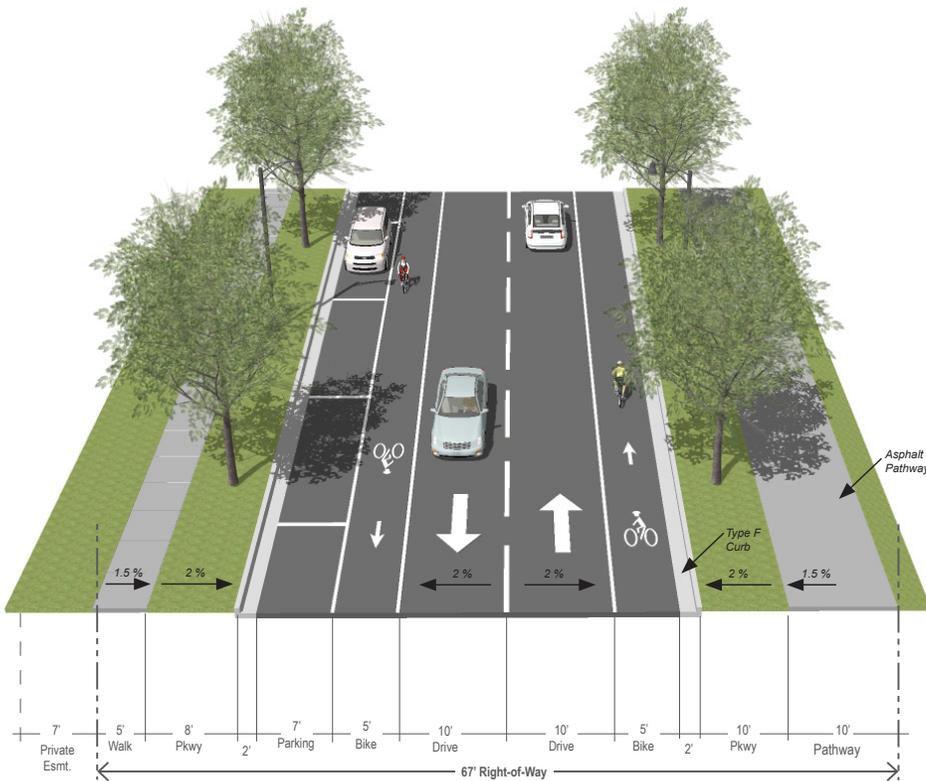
(b): Neighborhood Connector 2 Typical Section T4/T5
